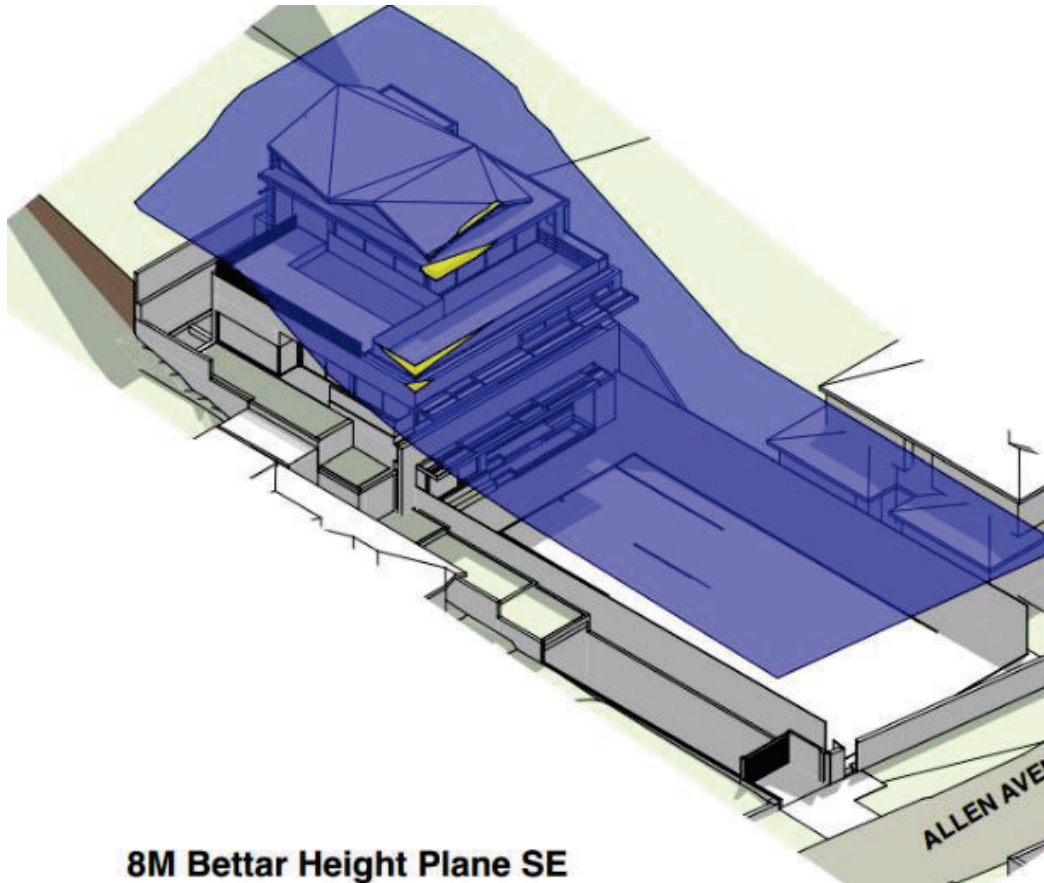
Plan extract showing 8 metre building height blanket (in blue) determined from assumed undisturbed levels on the site being the ground level (existing) of the land prior to any development occurring with the building height breaching elements shown in yellow.
